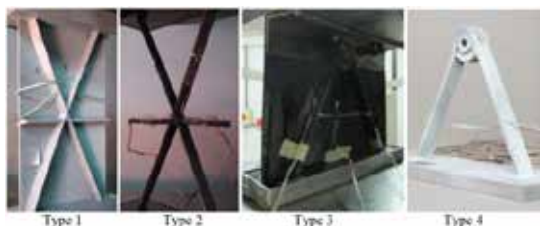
View of the Type-1, Type-2, Type-3 and Type-4 specimens before mechanical testing [14]
